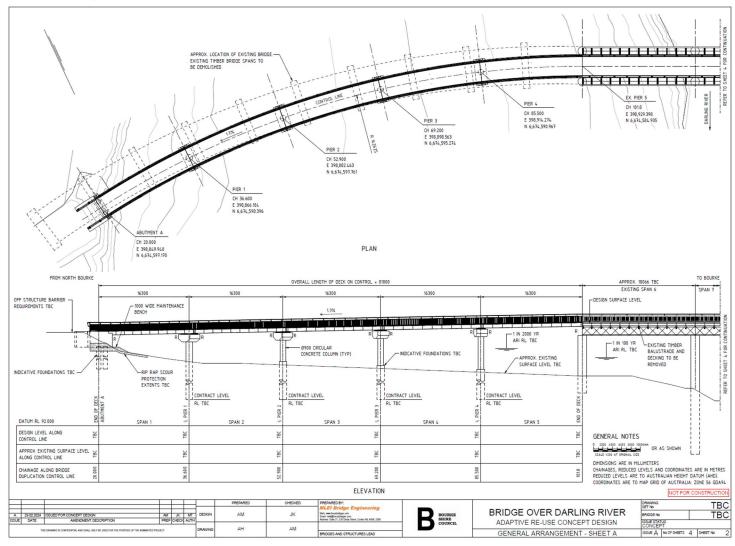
Western approach and elevation Source: MLEI Bridge Engineering
